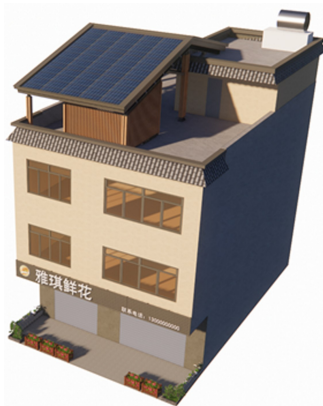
Overall design effect of photovoltaic sun pavilions and rural housing facade improvement
